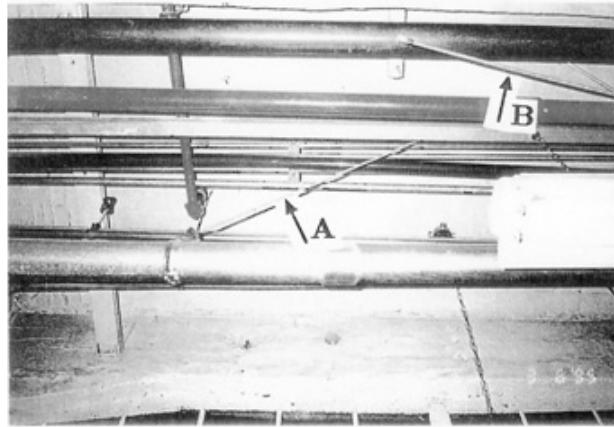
Failure of hanger rod supports (rods A, B) of piping system where the threaded end of the hanger rod is directly threaded into the ceiling by rawal plug has come out, Kobe earthquake, 1995, 6.9 M
